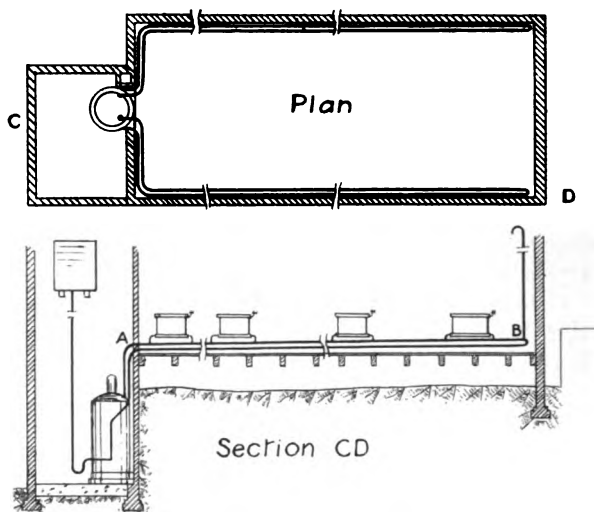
Two-pipe System, Plan and Sectional Elevation.
